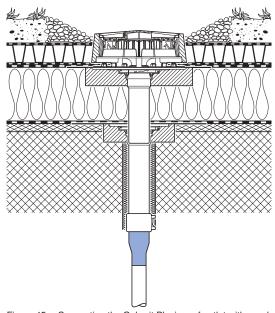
Connecting the Geberit Pluvia roof outlet with a reducer
